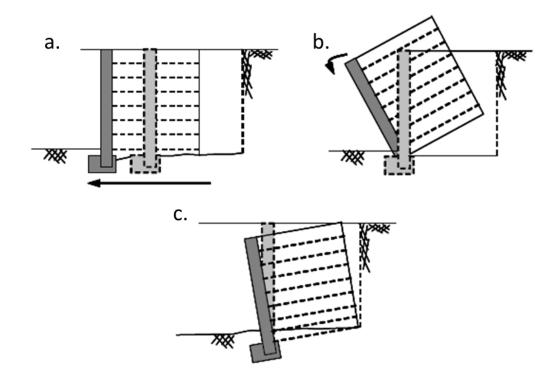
External stability failure cases: (a) sliding, (b) overturning, and (c) bearing.
